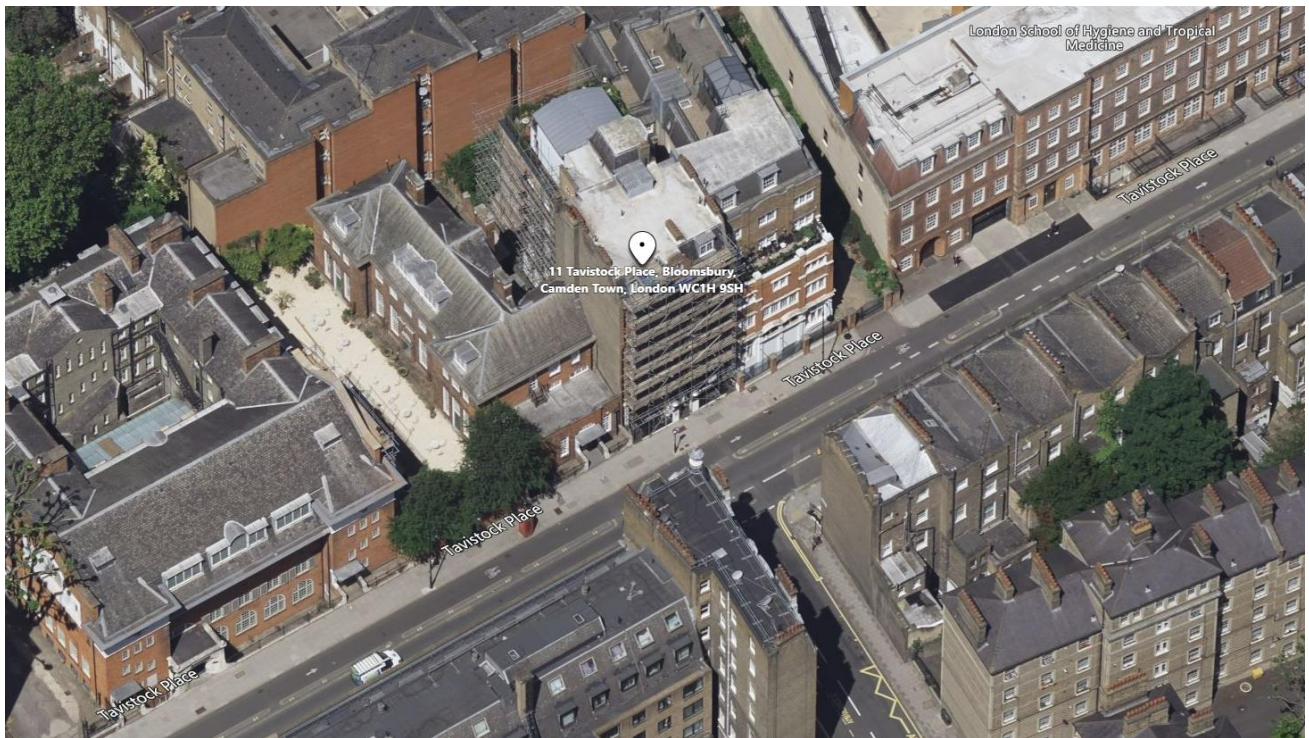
Aerial of site (unfortunately shown with scaffolding)
